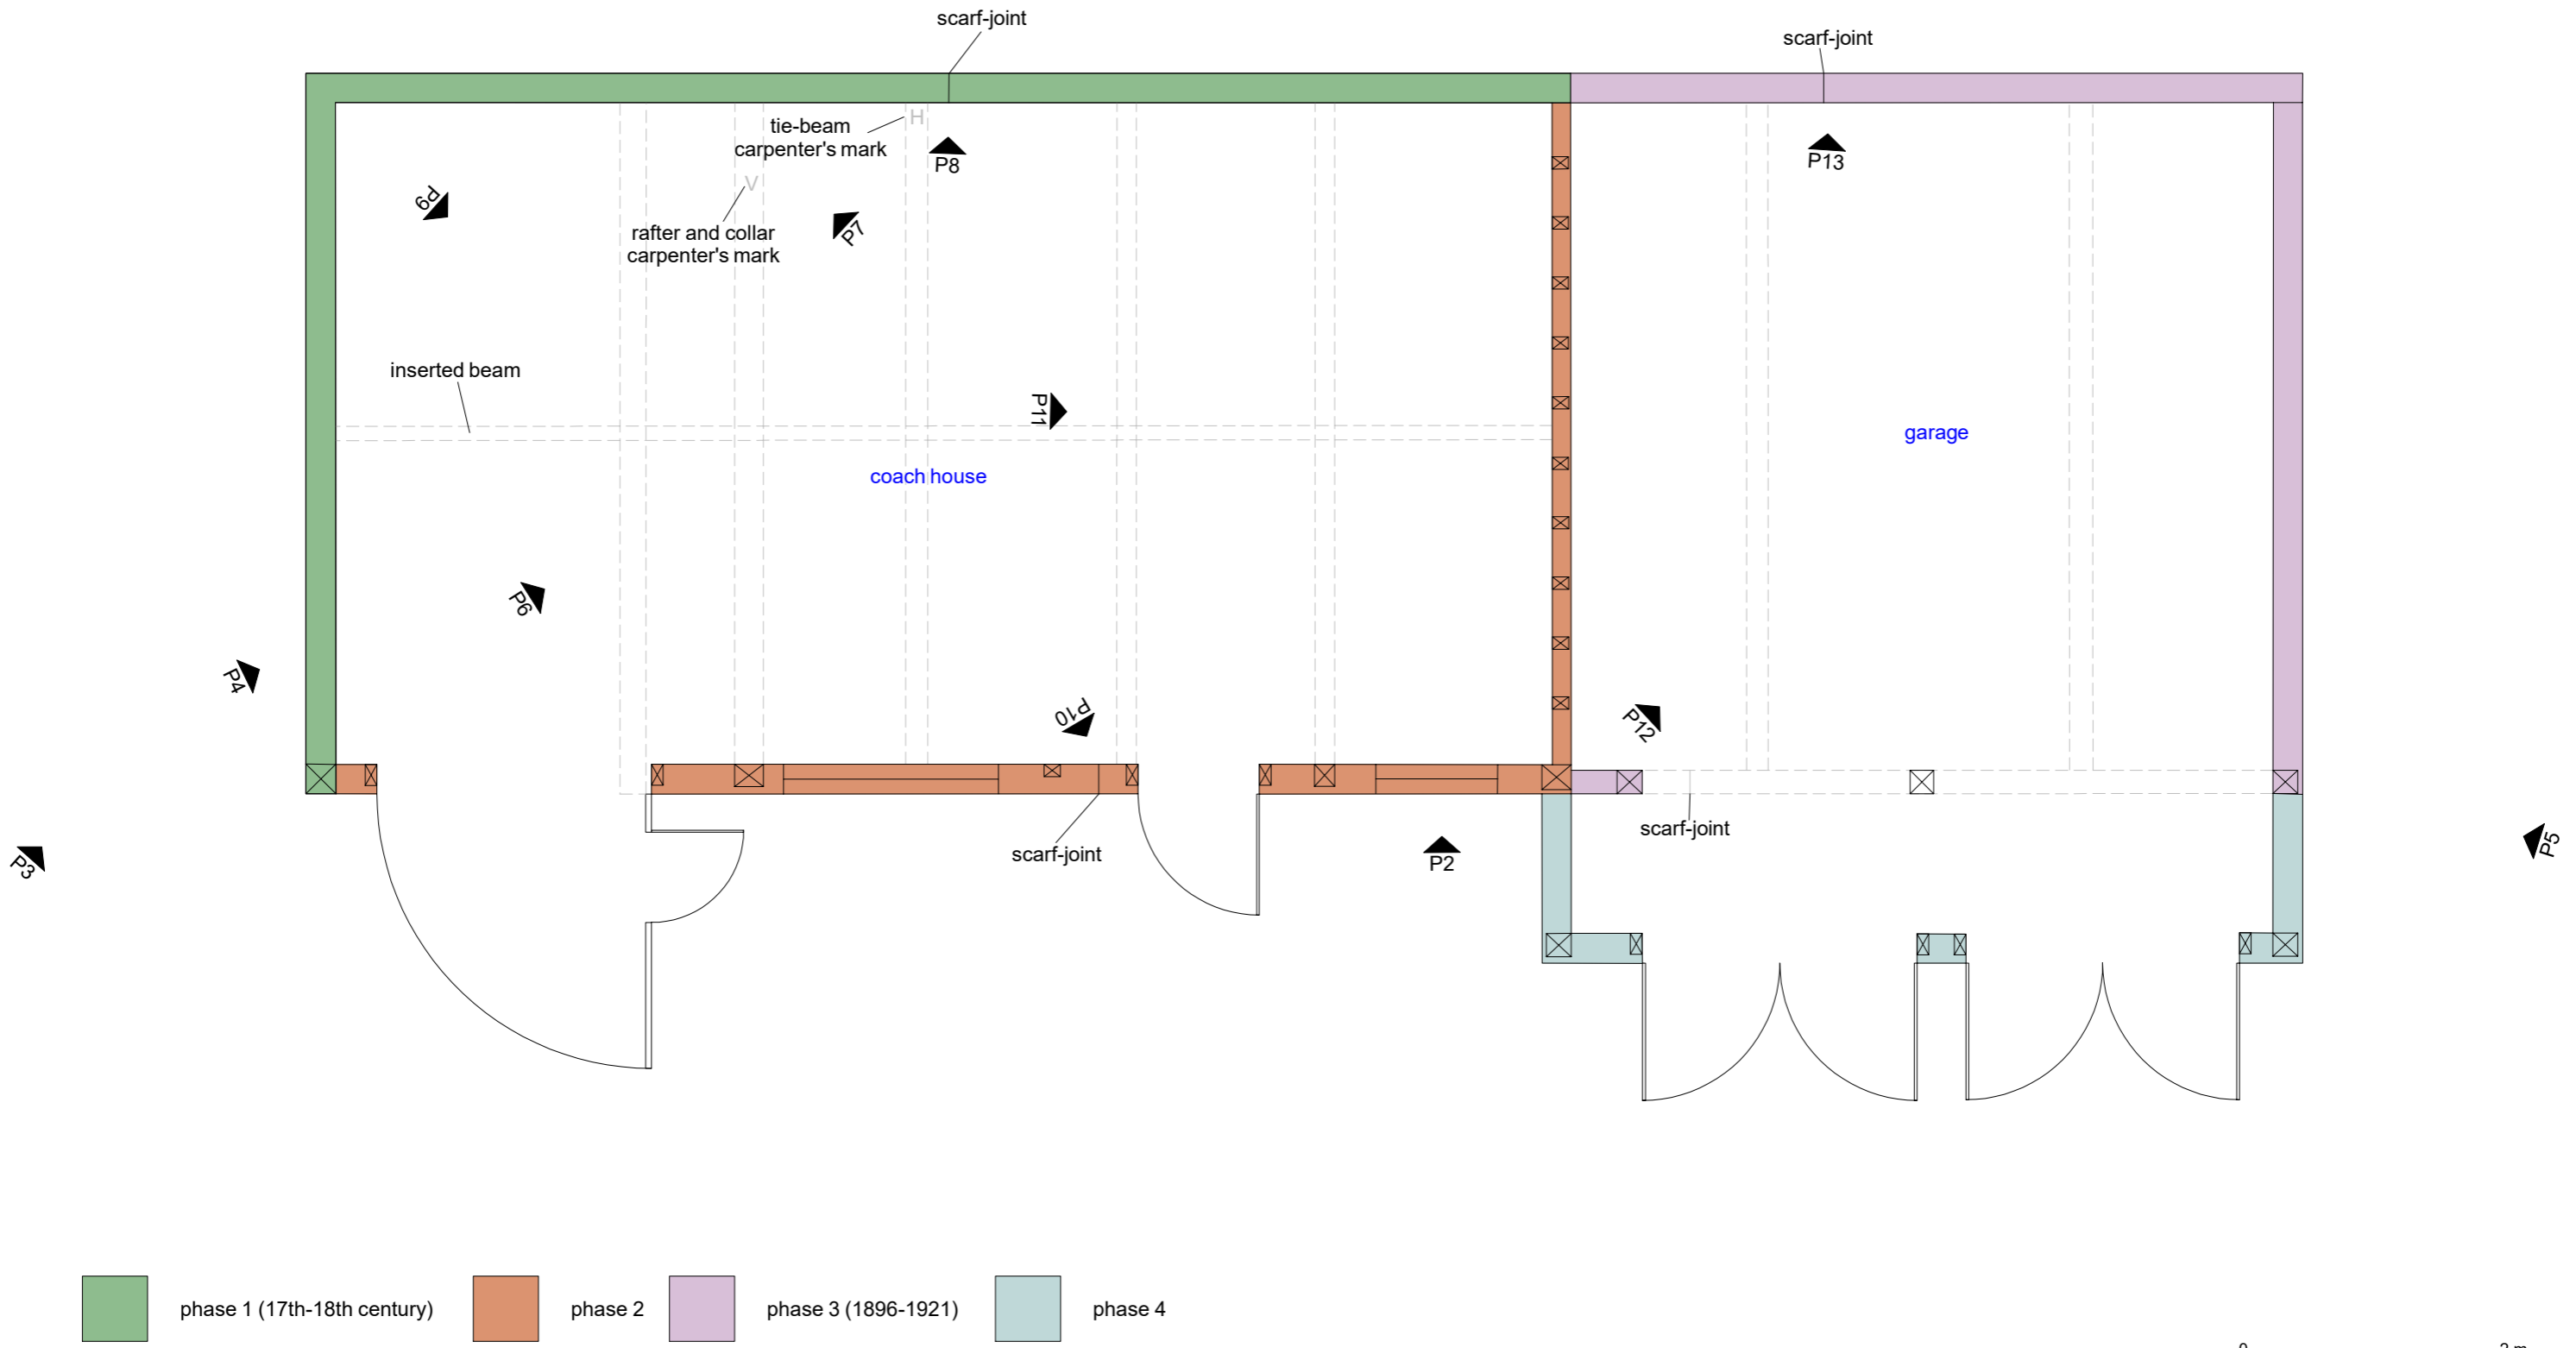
Floor plan. Location and direction of photographs reproduced in text shown.
